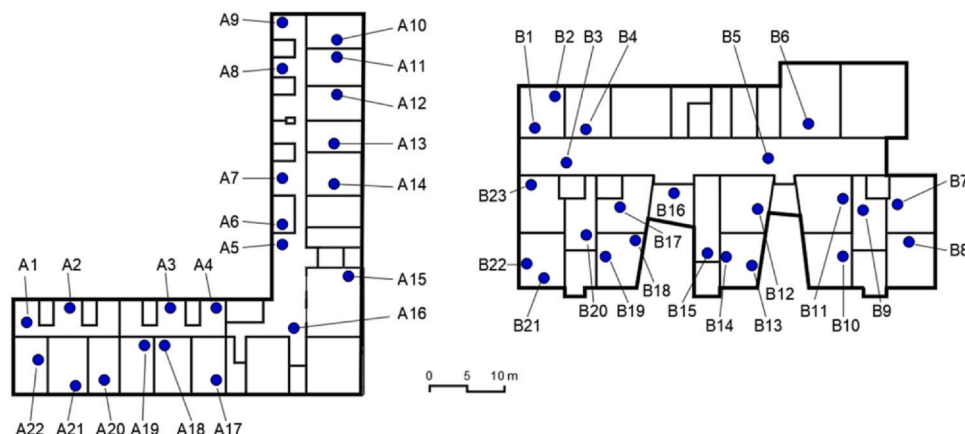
Floor plans and locations of air cleaners in the day-care centres A (left) and B (right) during the intervention study.
